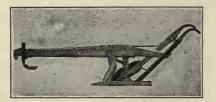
Railroad plow used in breaking up hard earth preparatory to handling with scraper or reversible machine.
